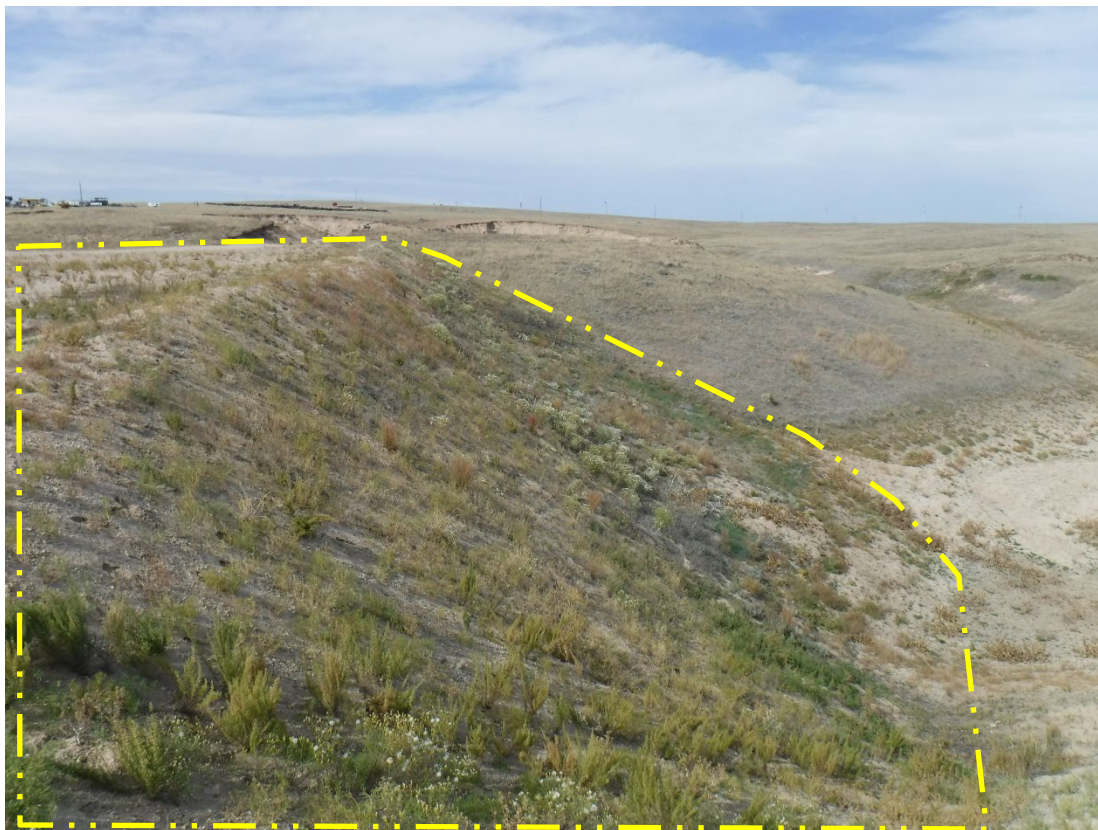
Looking west from south end of dam, material outlined in yellow has been placed by landowner during pervious land leveling activities
